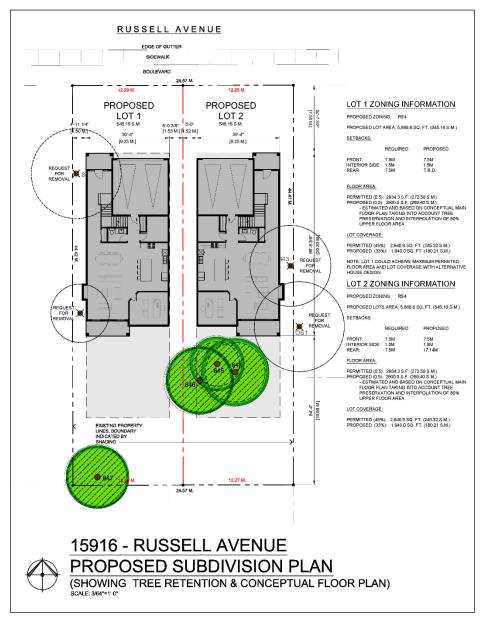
Proposed Subdivision Plan (15916 Russell Avenue)
